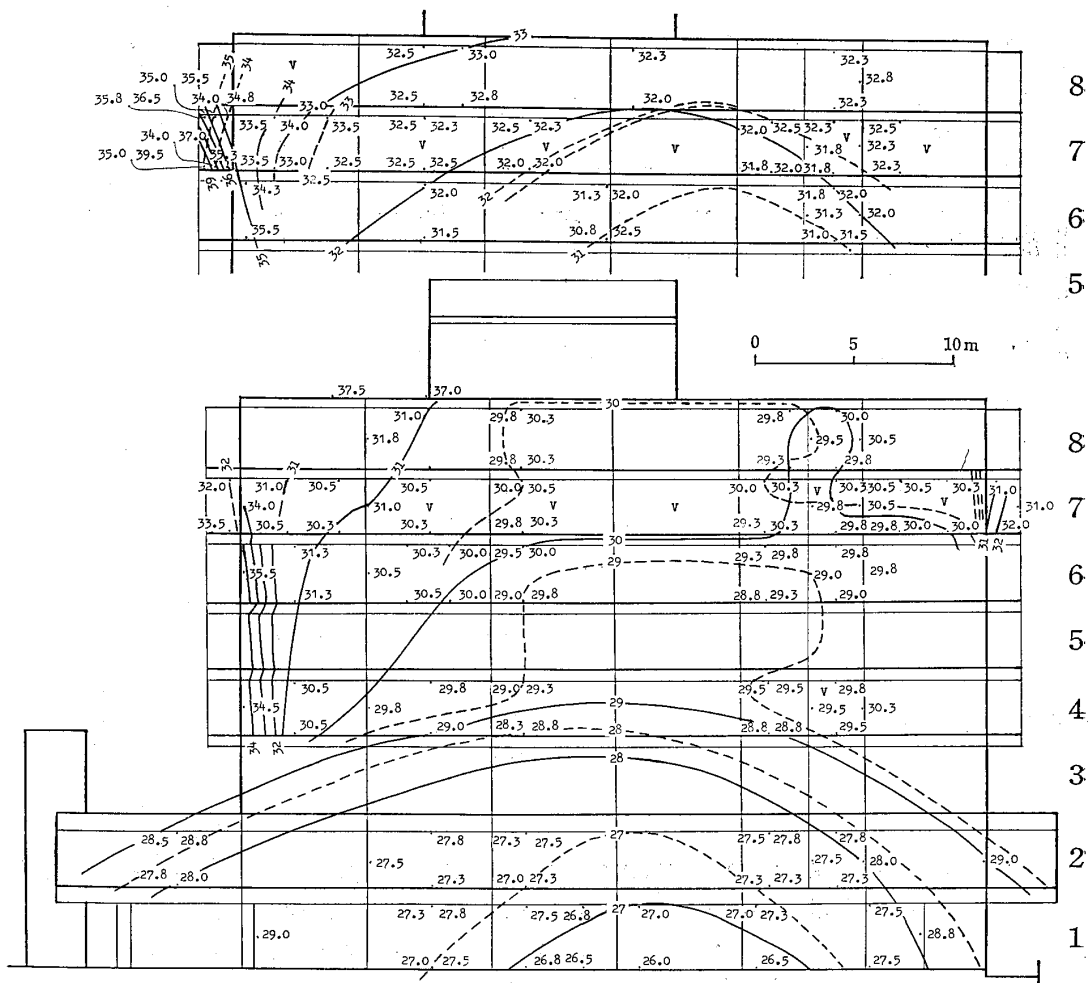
Vertical temperature distribution of ceiling, floor, wall and glass wall, observed on Aug. 8th (upper) and 31st (lower).
